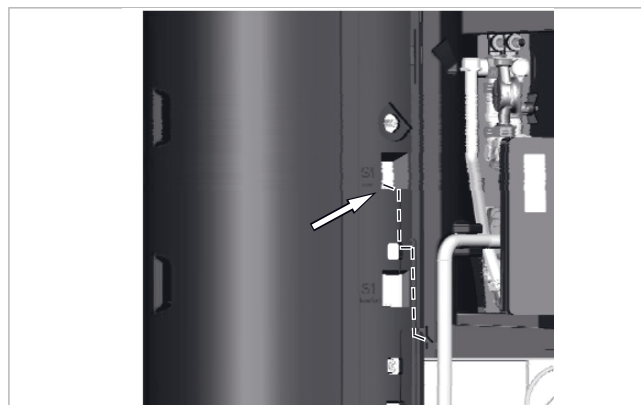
Fitting sensor S1 in position "S1 Eco"
